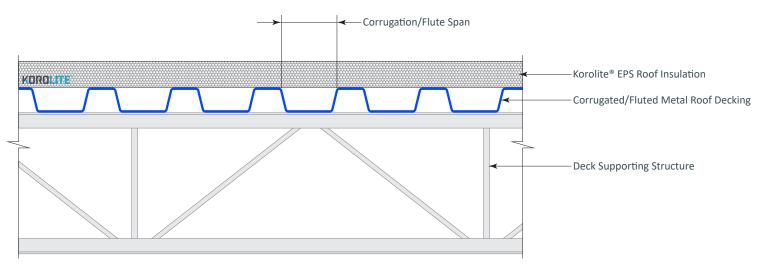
Korolite[®] EPS Roof Insulation minimum thickness
